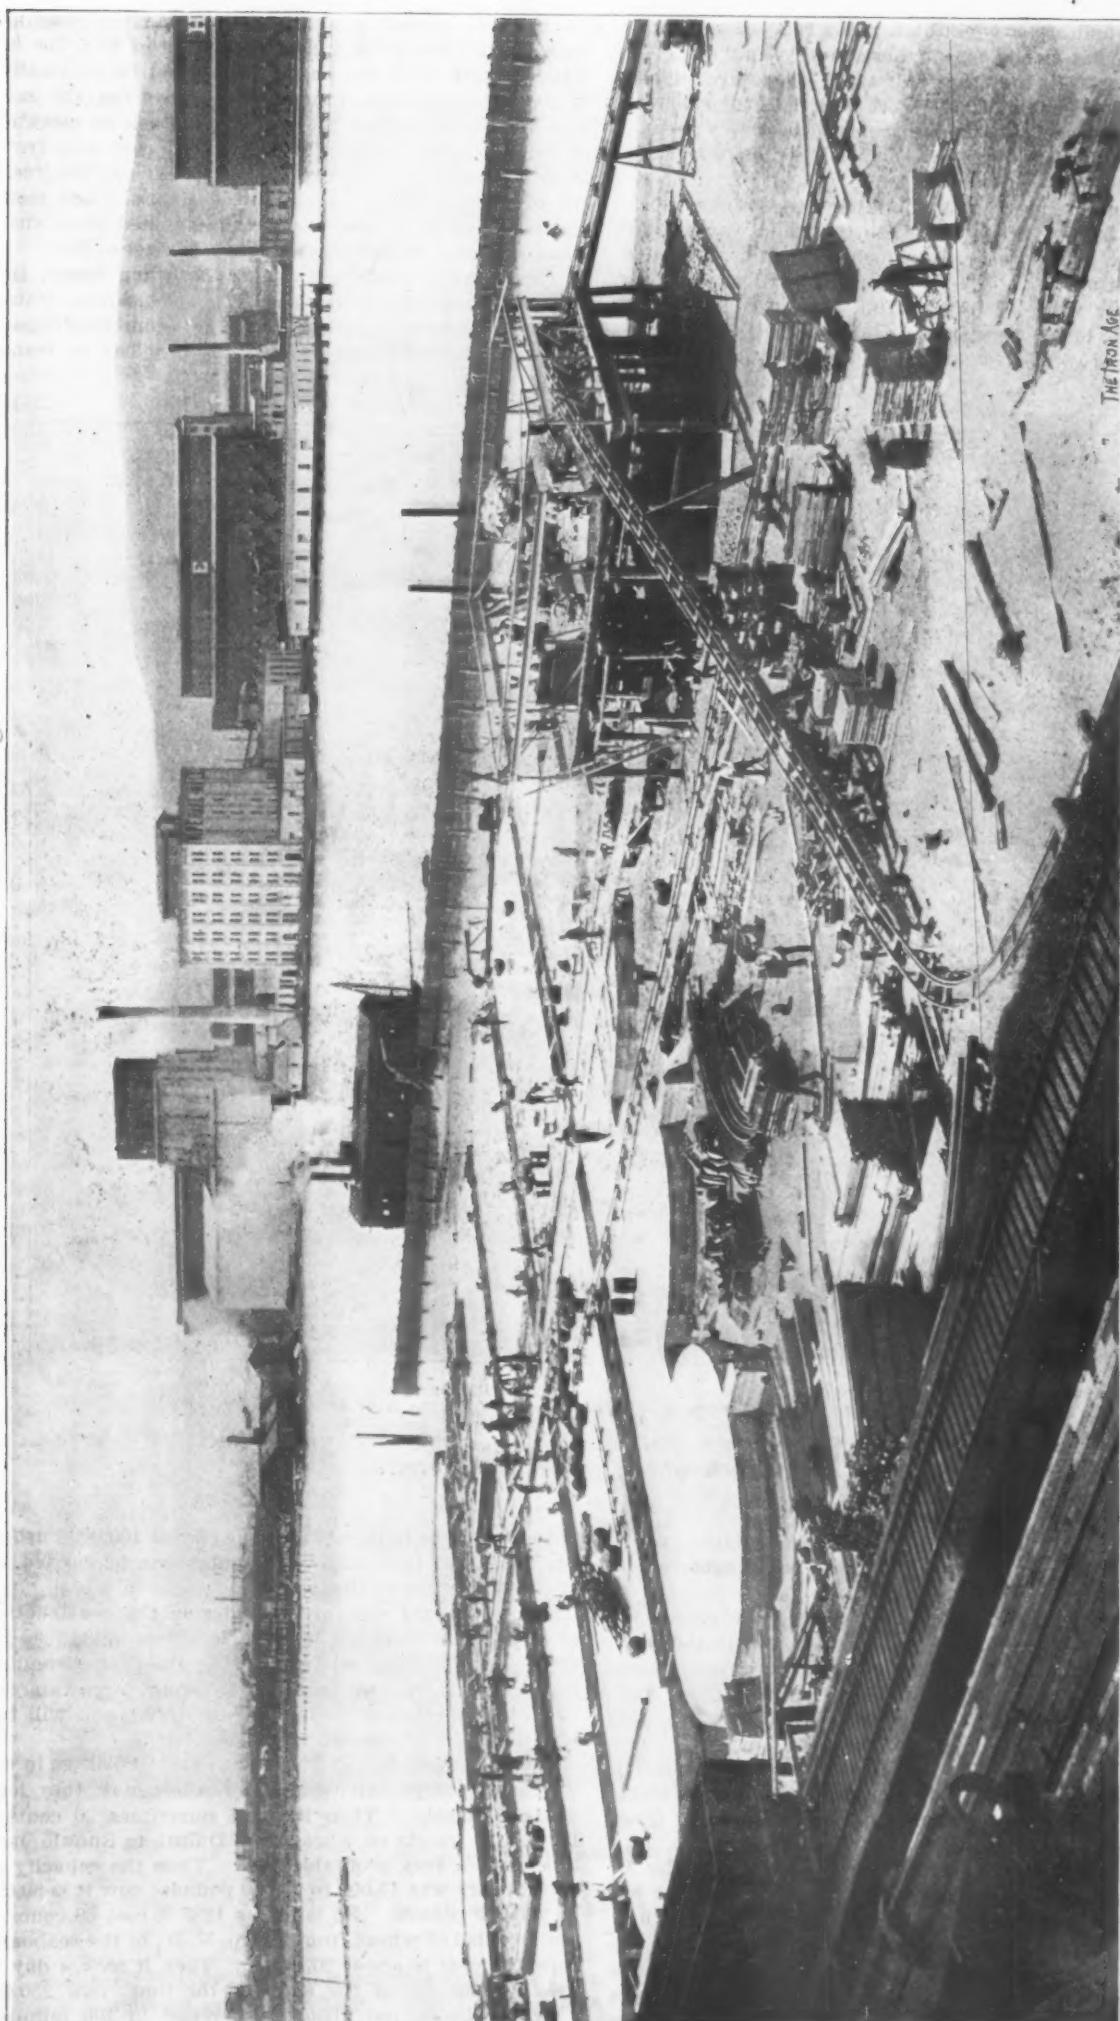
Foundation of Concrete Elevator, with Concrete Mixing Plant and Hydraulic Dredge, with Wood Elevators in Background.
